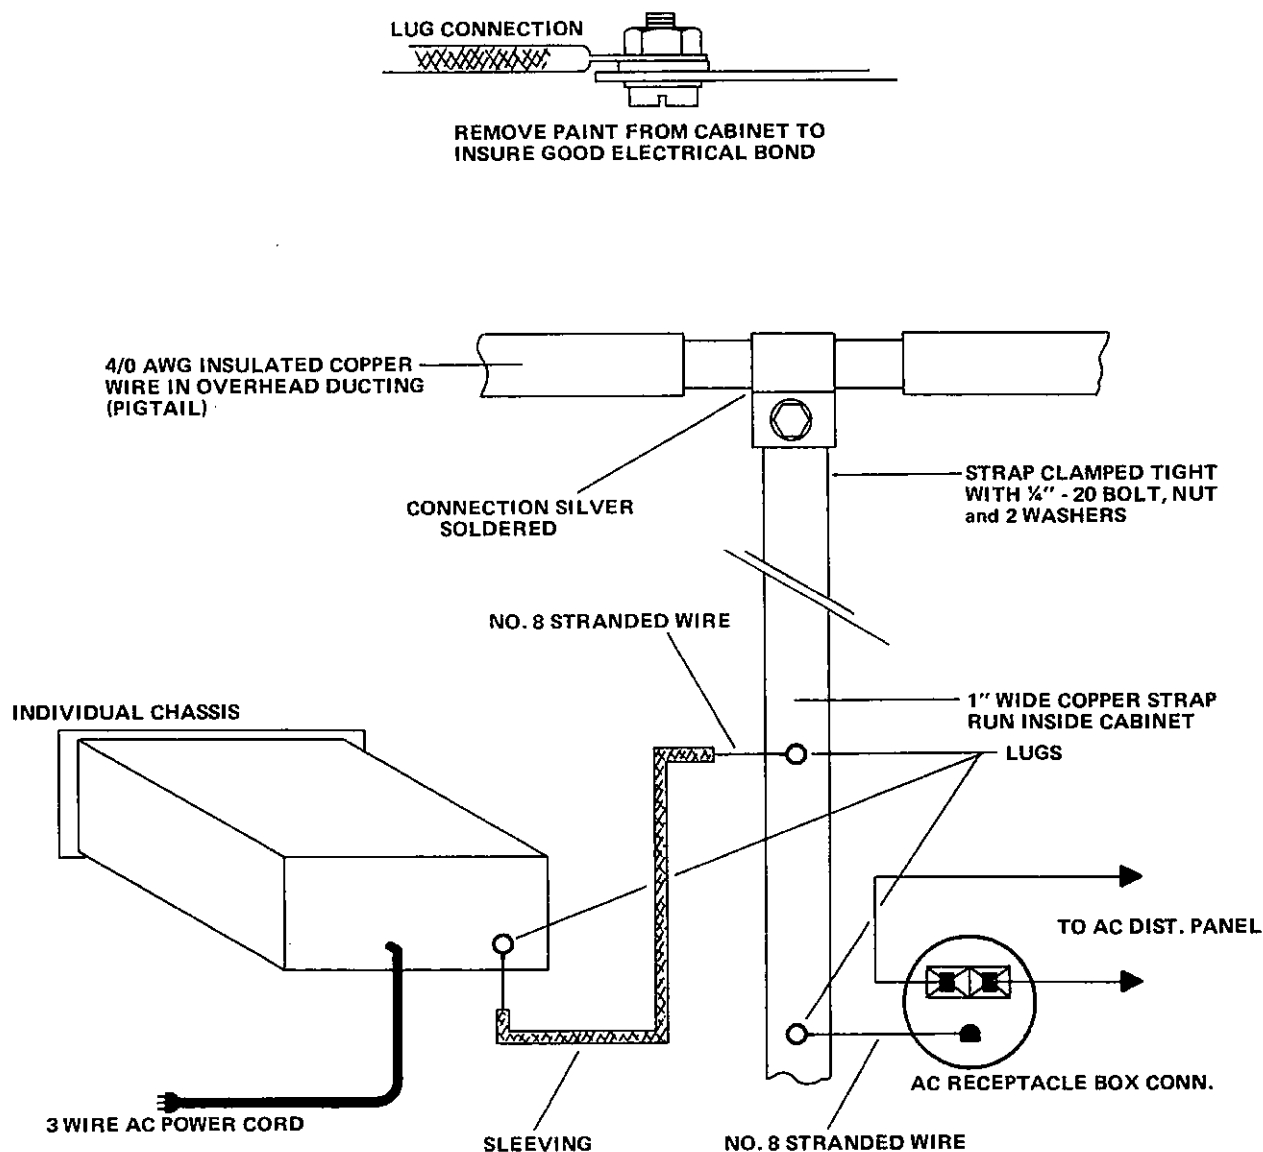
Chassis and Cabinet Grounding Details for Overhead Ducting
